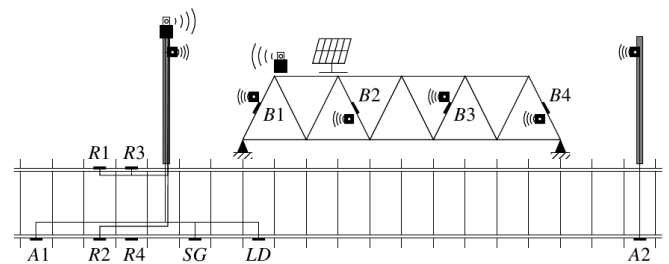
Scheme of the sensors mounted: B1-B4 - piezo sensors mounted on the bridge, R1-R4 - piezo sensors mounted on rails, A1-A2 - activating piezo sensors, SG - strain gauge, LD - laser sensor for displacements.
